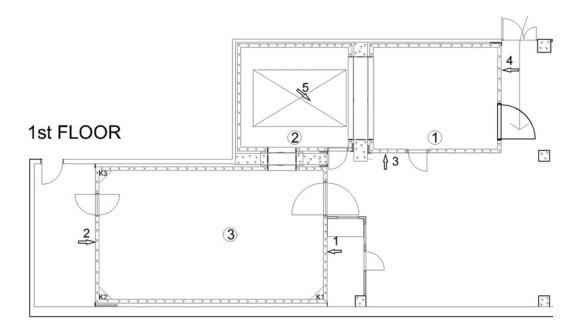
Layout of the 1st floor of the acoustics laboratory (rooms 1–3). The investigated walls and the floor are indicated with arrows. The floor was on top of room 2 and tapping machine was located on 2nd floor.
